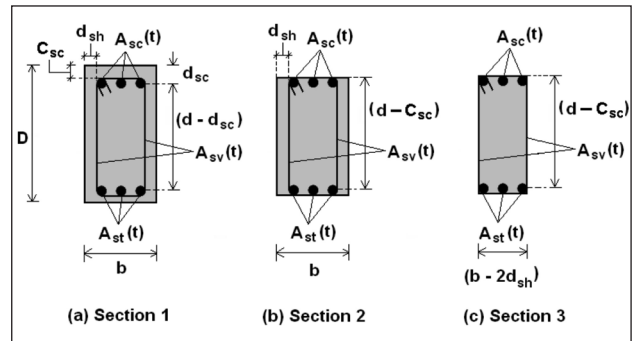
Different schemes of deteriorated reinforced concrete sections for corroded RC beams (Rodriguez et al. 1997)
